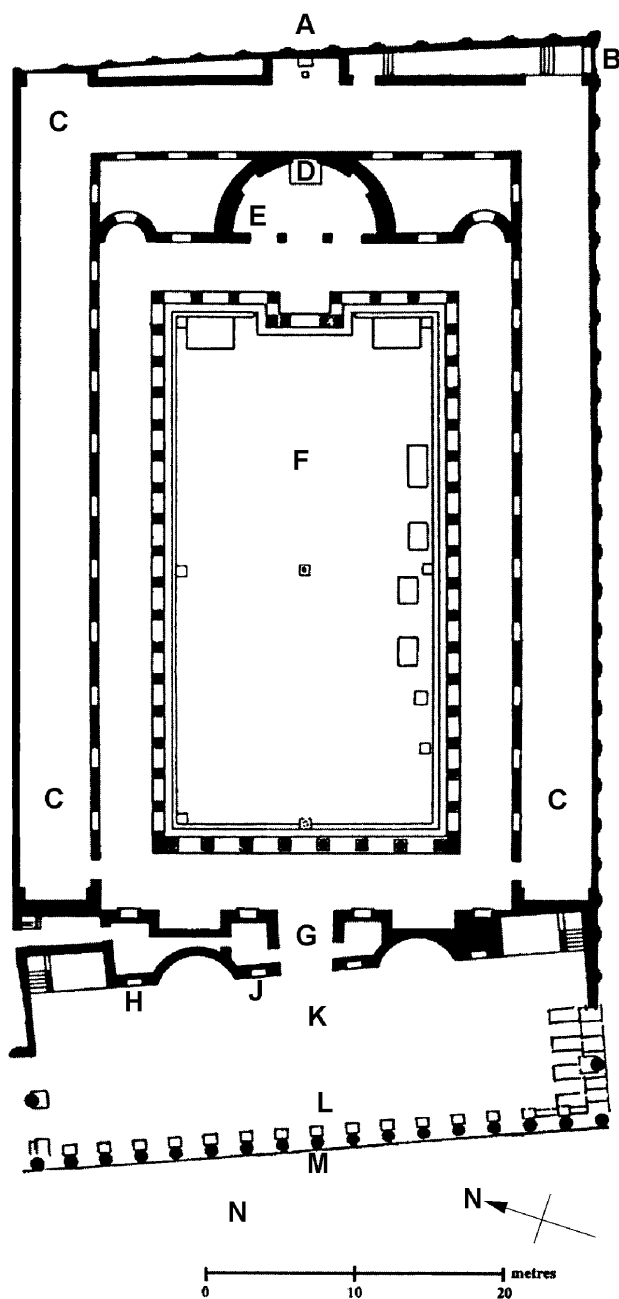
Plan of Eumachia's Building (L.H. Davies).
